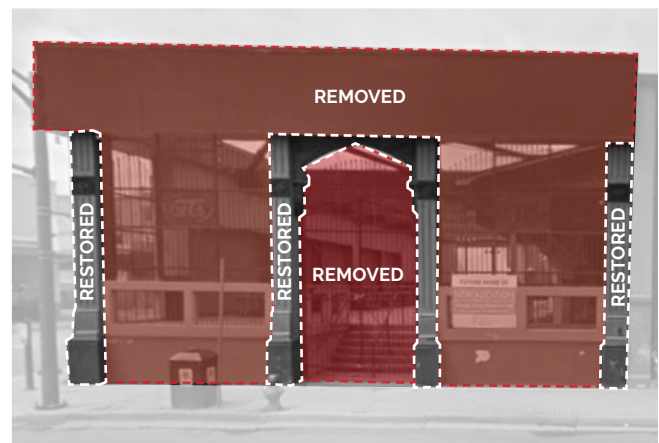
329 Richmond Street Changes, East Elevation
